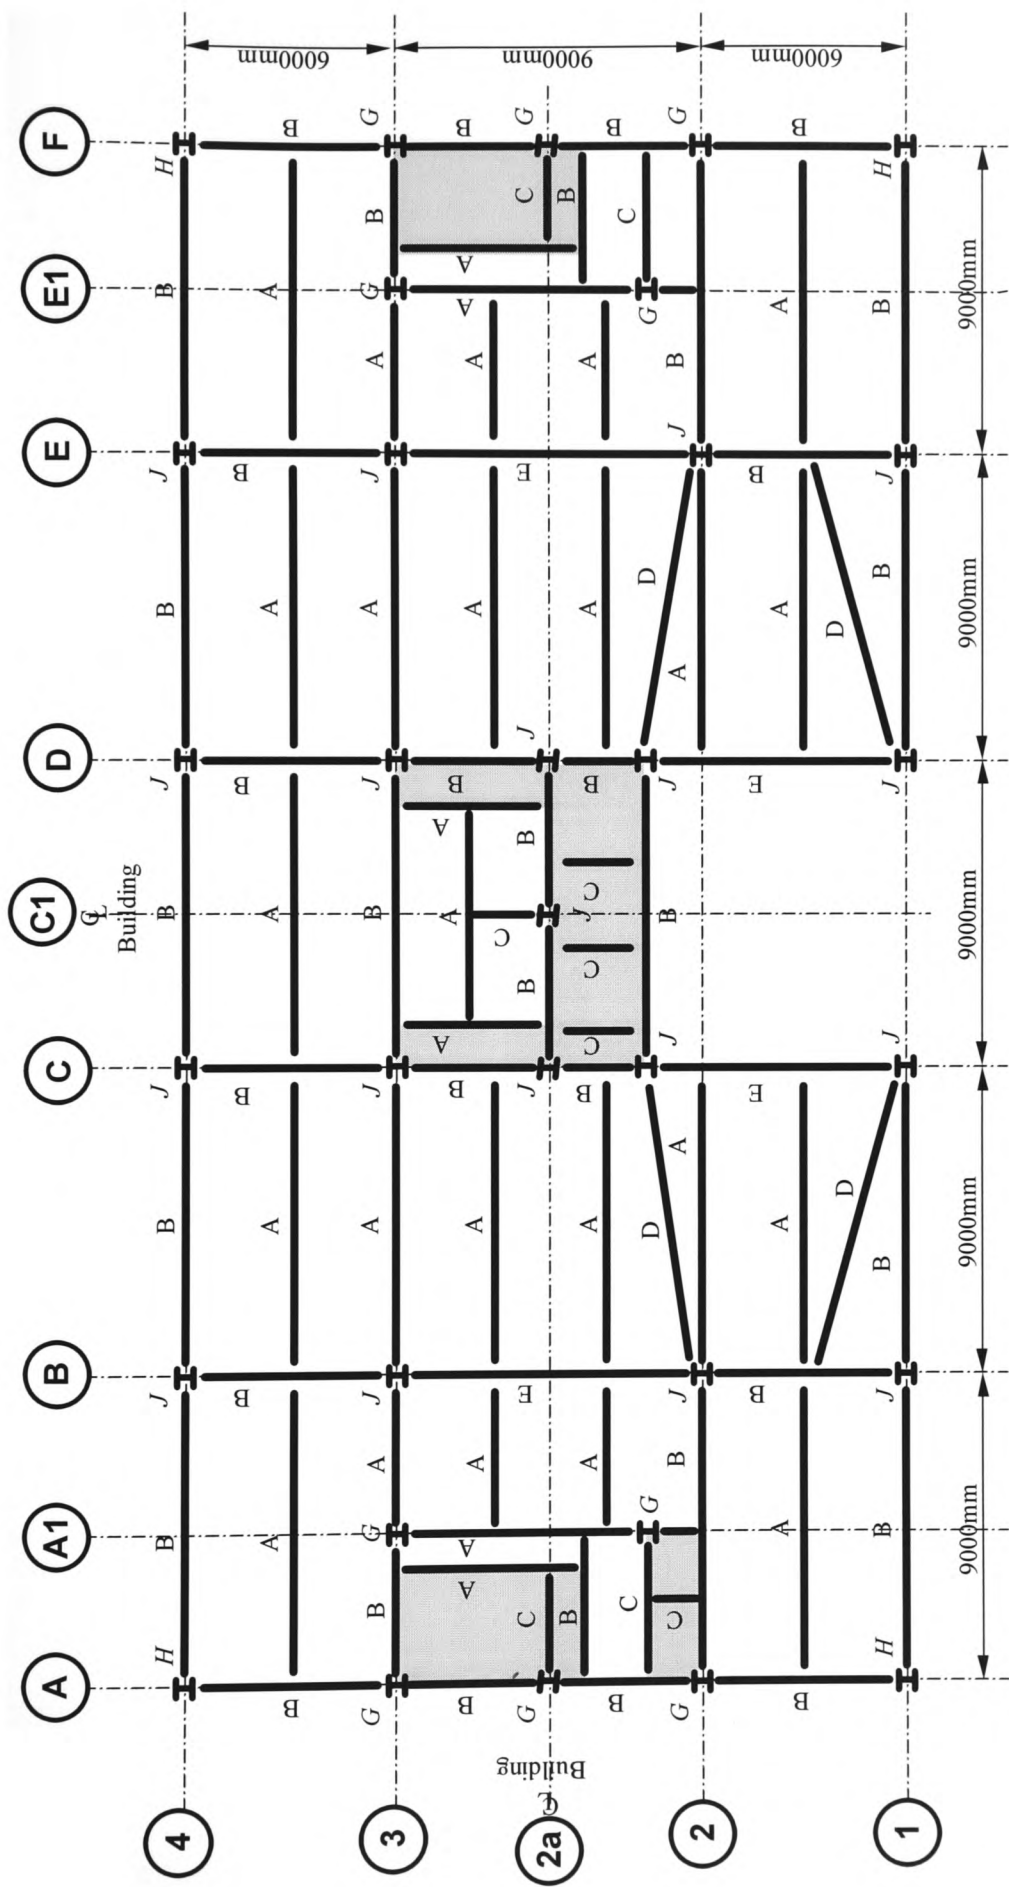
Plan on 1st floor showing the general layout of the main structural elements
